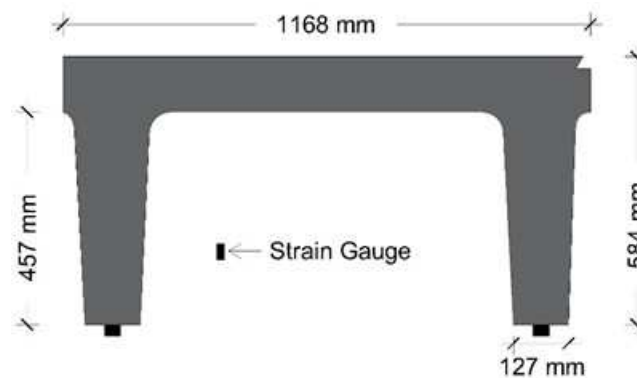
Pictures of the DT Bridge TestedFigure 2. Cross Section of Double-Tee Girder*Bridge B
